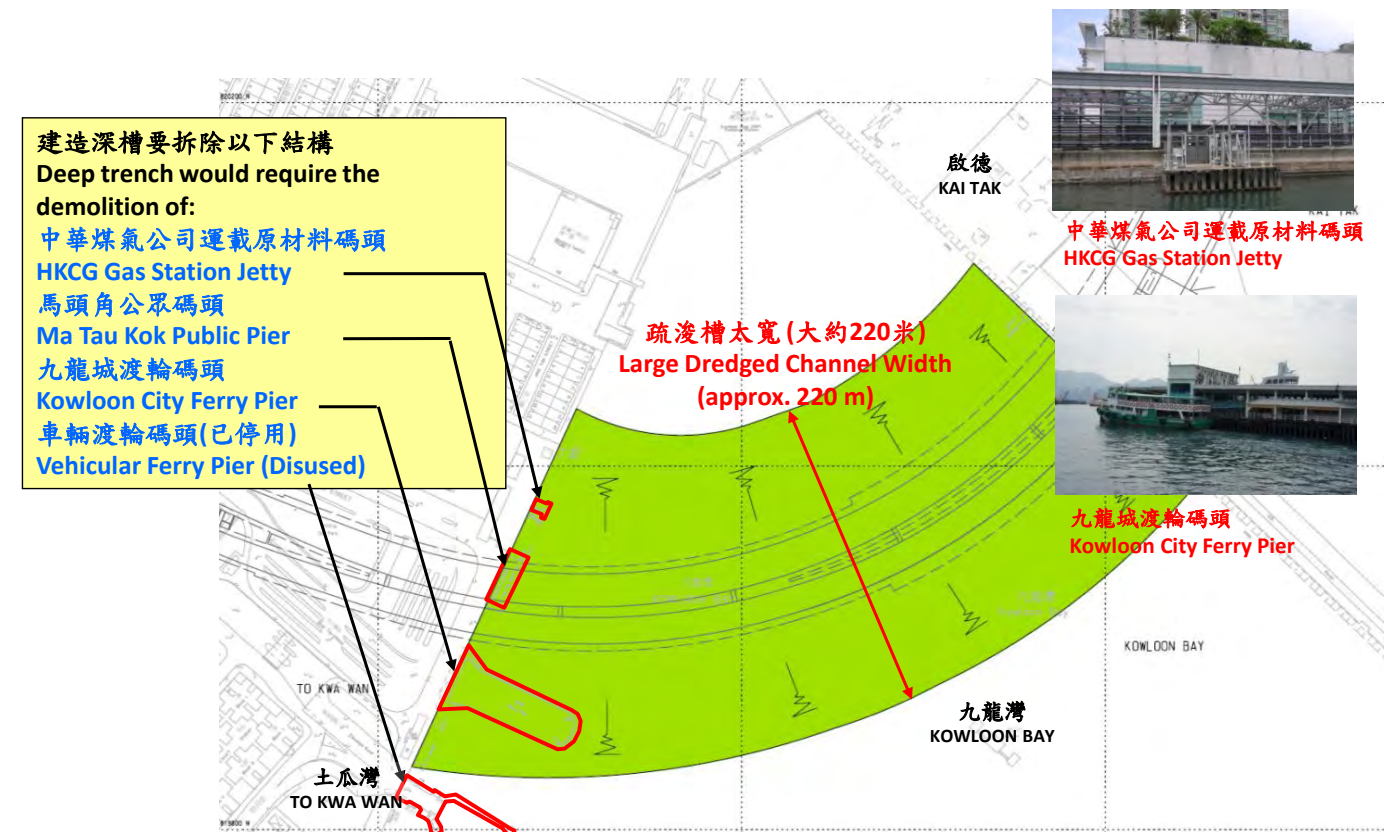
Structure to be Affected by Trench Excavation for IMT
